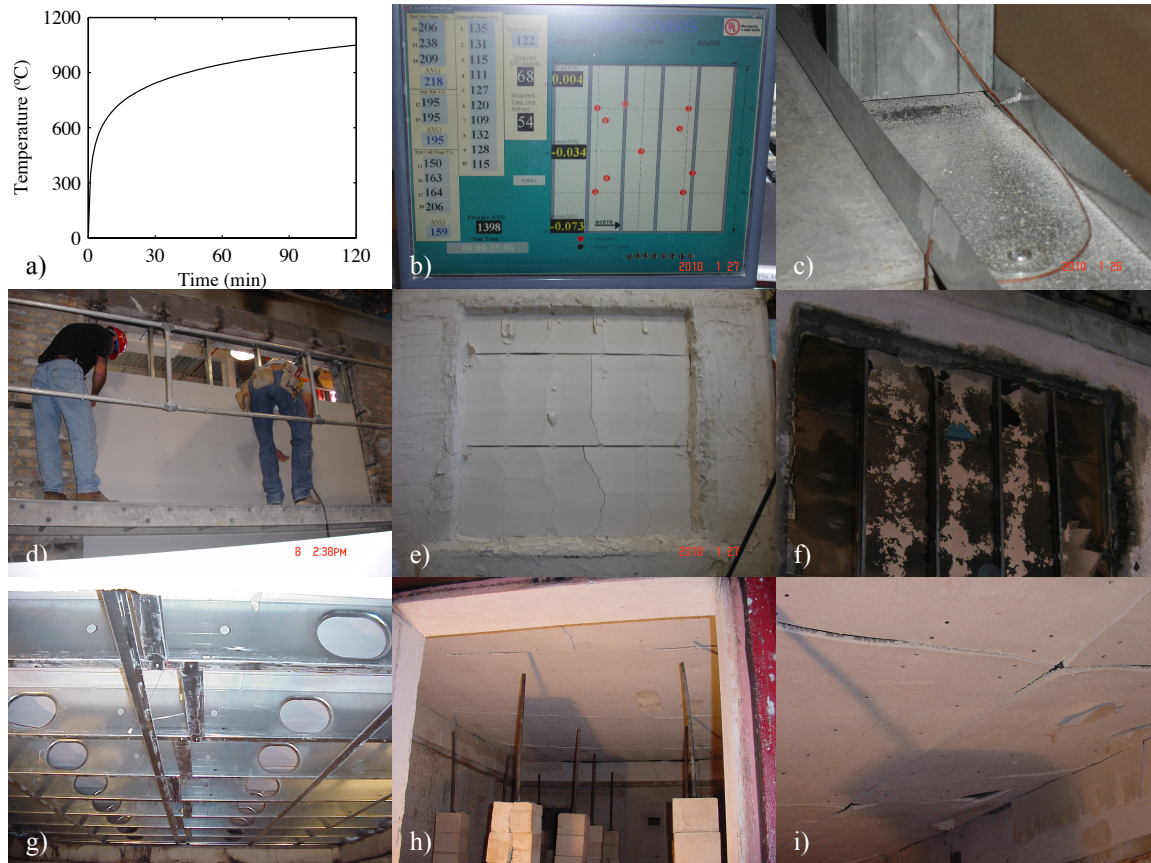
Proprietary ASTM E119 fire test results on walls (d-f) and floors (g-i) provided by ClarkDietrich Building Systems (a) prescriptive time-temperature curve, (b) thermocouple readings from wall test, (c) thermocouple installation, (d) installation of wall in furnace, (e) wall exterior during test, (f) wall interior and calcined gypsum board after test, (g) proprietary floor system showing blocking and strapping of joists (h) underneath floor before test, (i) after test
